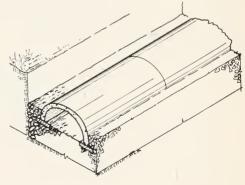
Cross section of half-section concrete pipe drain line. Note boards on which the pipe rests.
